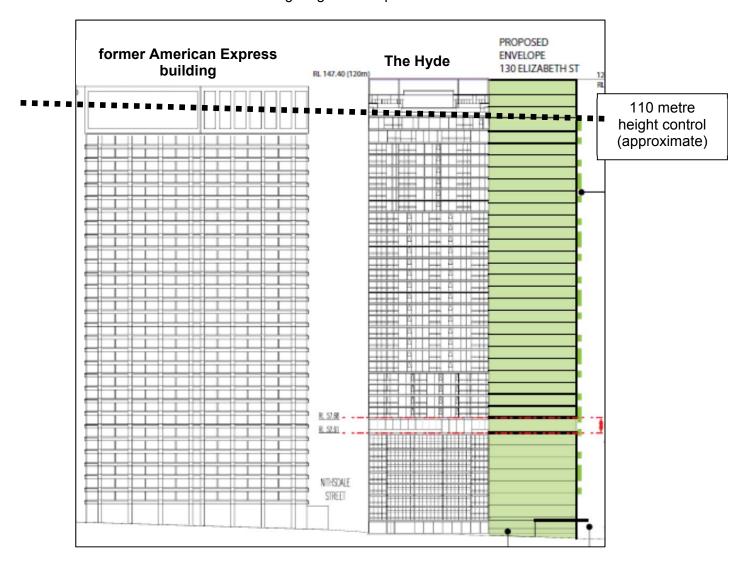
View of the northern elevation of proposed building envelope illustrating the extent of technical breach to the building height development standard
